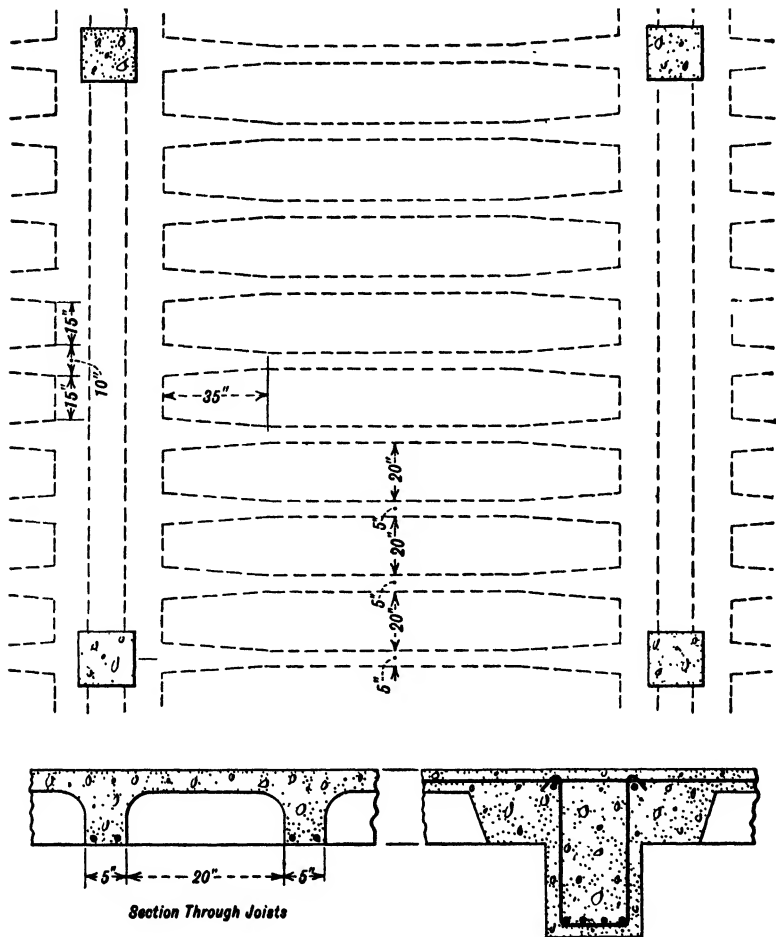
Typical Panel for Steel Tile Construction. (See p. 602.)
